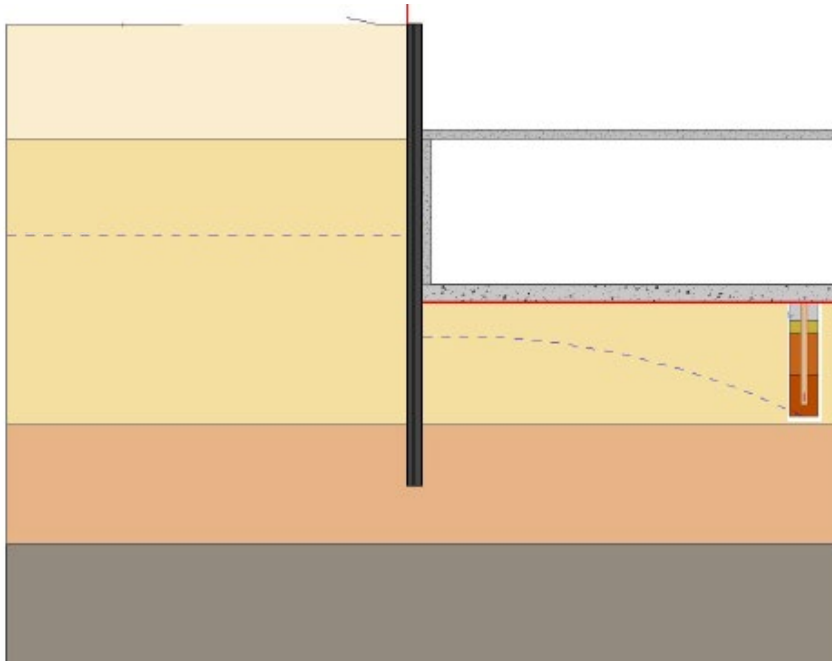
Indicative dewatering intent showing sheet pile wall and dewatering wells within excavation.
